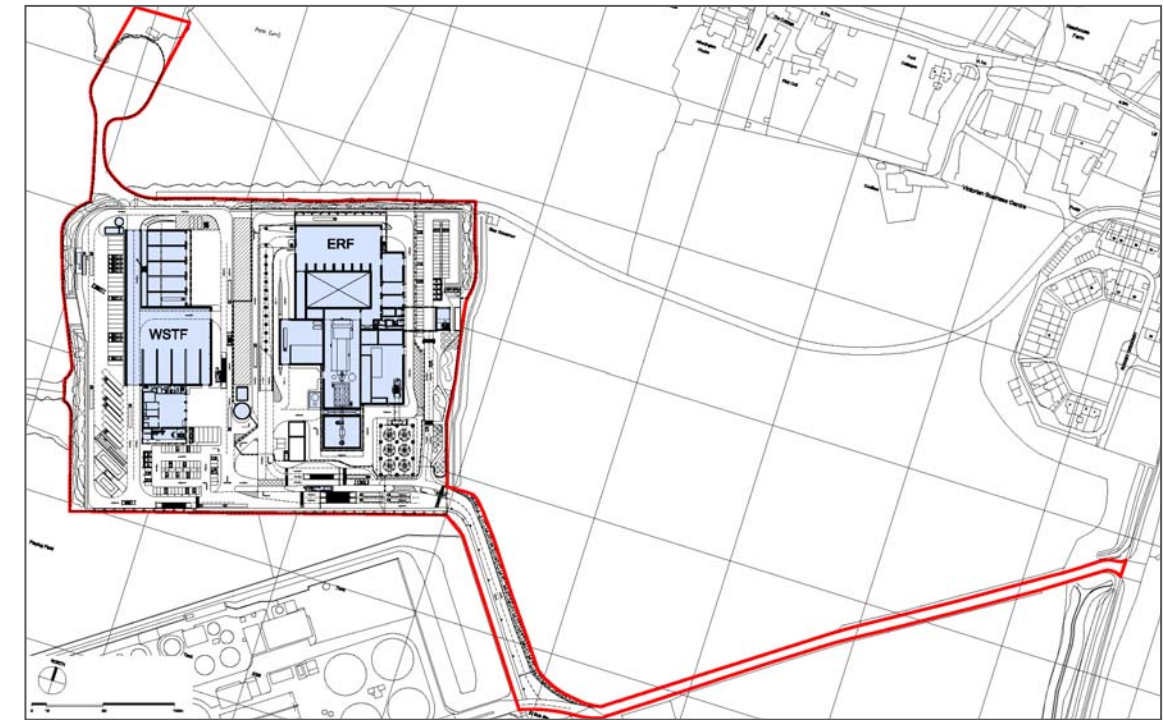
Proposed Site Plan – extract from drg PL105
